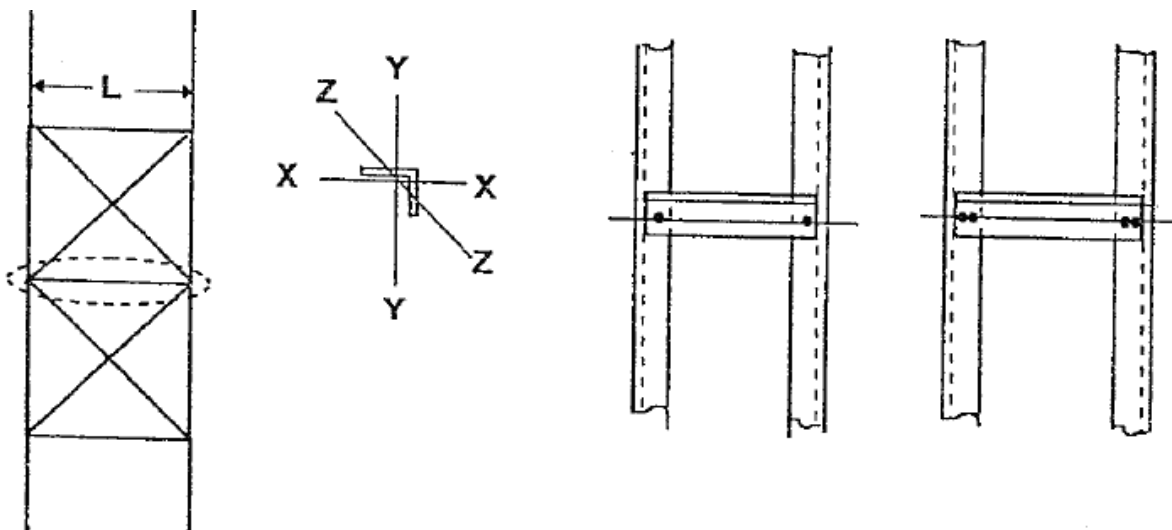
Effect of end Connections on Member Capacity Single Angle Detail
